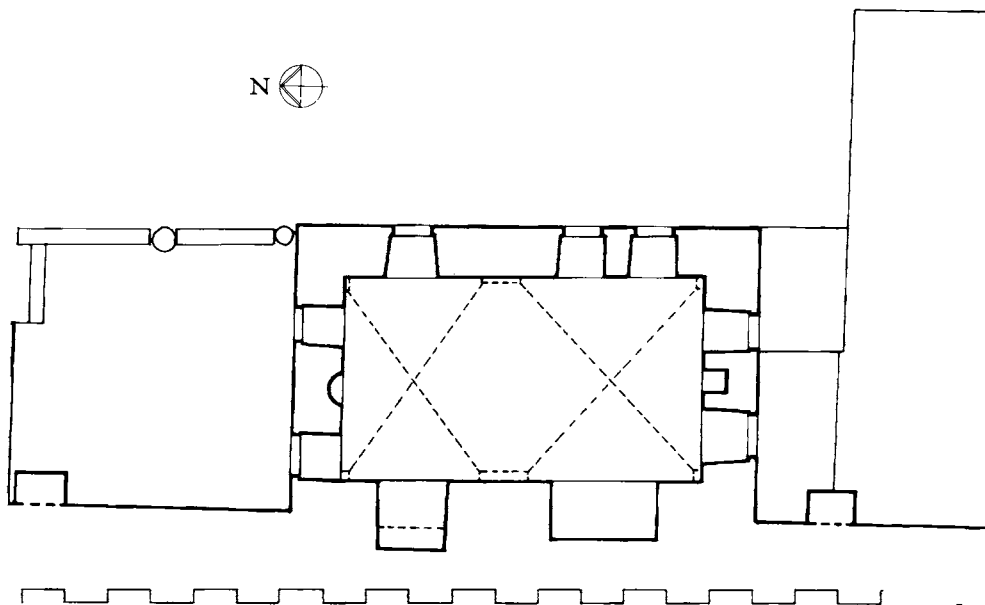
Khalwat Bairam Pasha, plan of basement.
